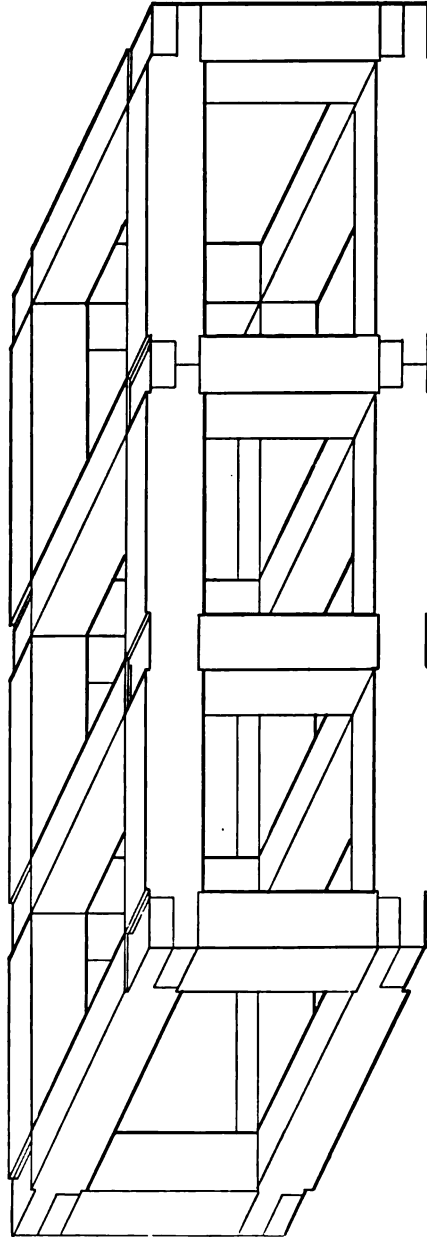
FRAME OF RECTANGULAR SHAFT SET, ASSEMBLED.
